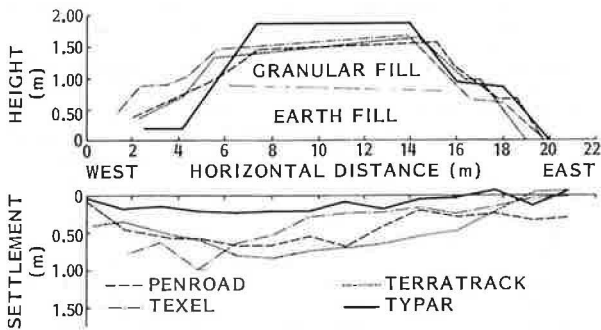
Manchester Embankment Cross Sections, showing fill height and settlements
